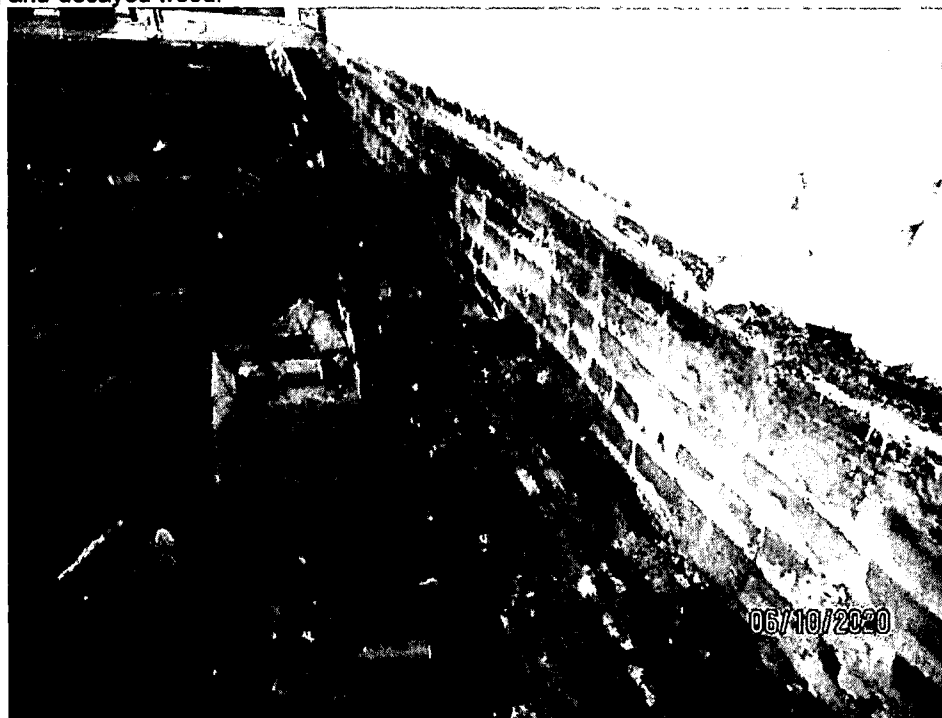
View of decayed ledger beam adjacent to the west foundation wall.
